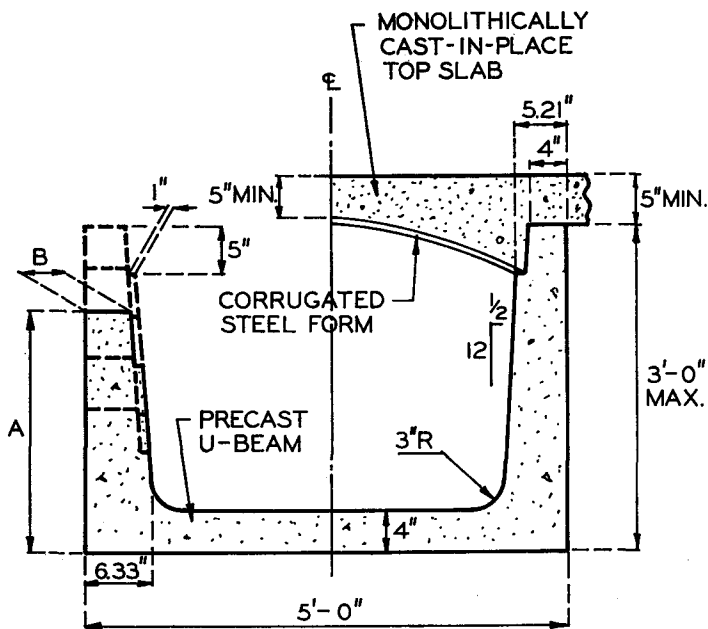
Typical cross-section of the composite U-beam bridge deck
